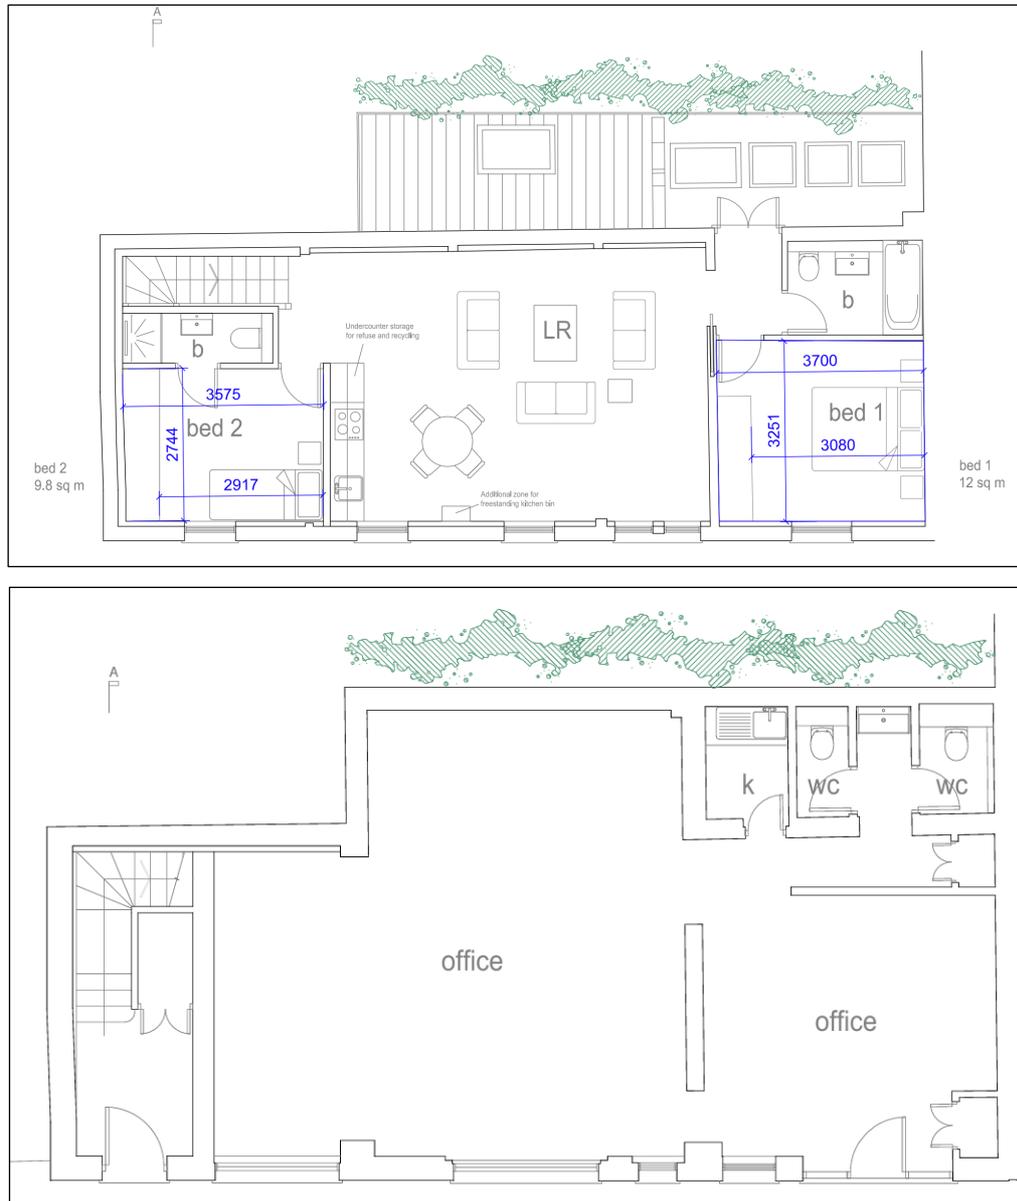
Top image: Proposed first floor layout. Bottom image: As existing ground floor layout.
